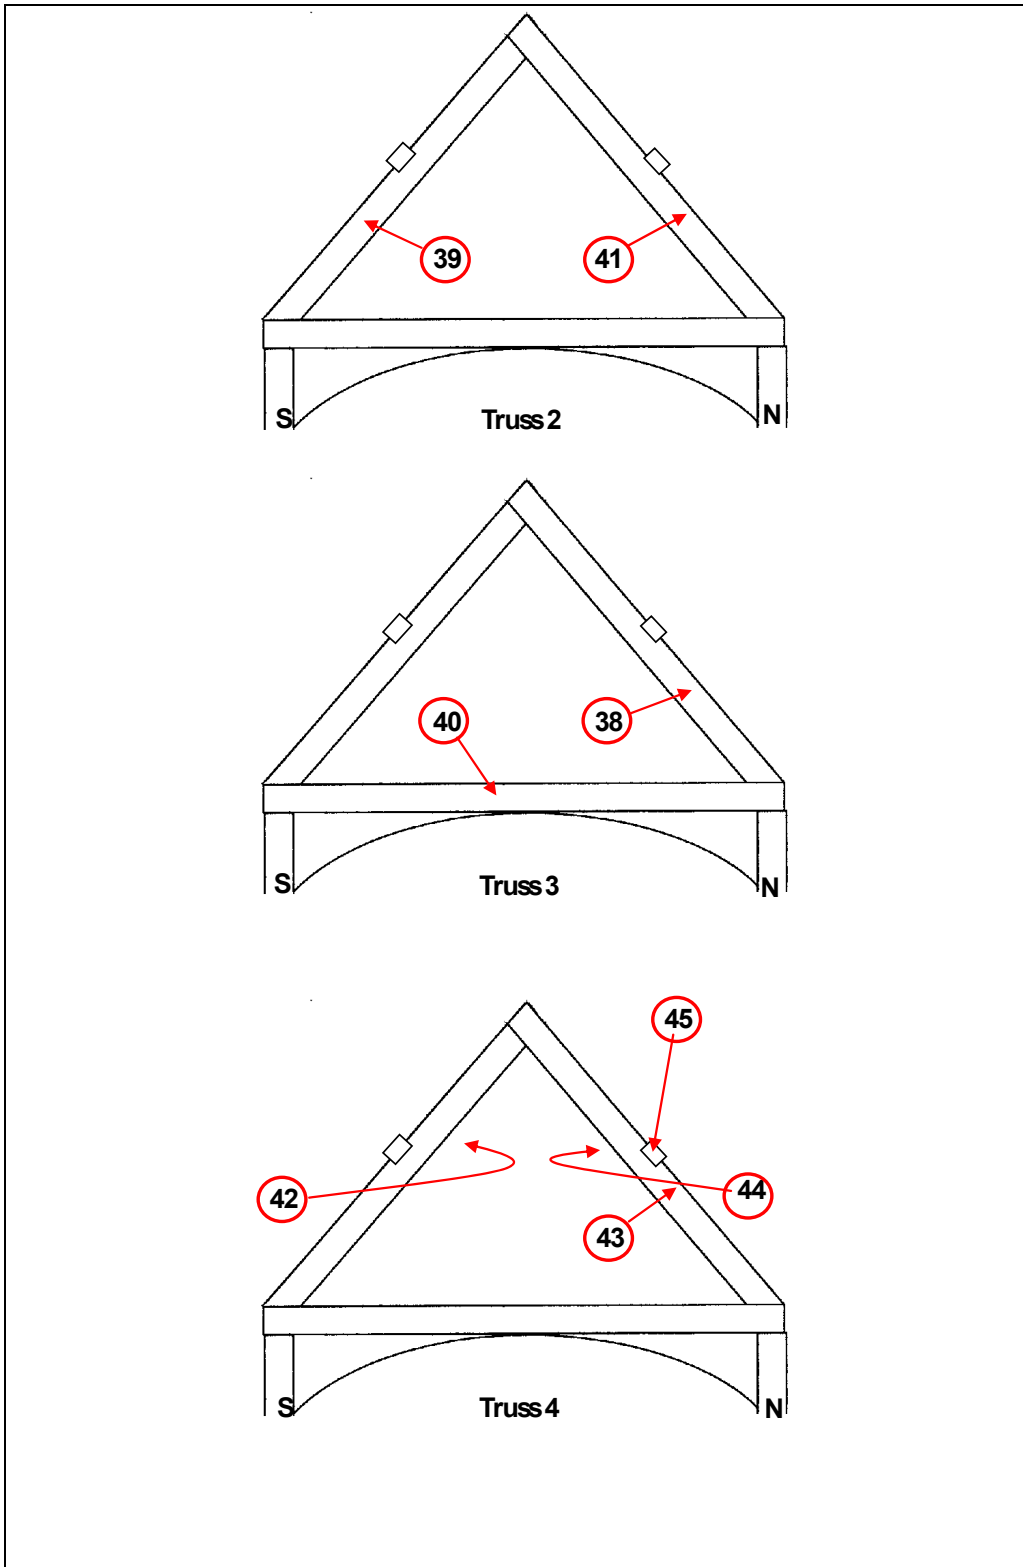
Trusses 2–4 of the south aisle roof to show sampled timbers
